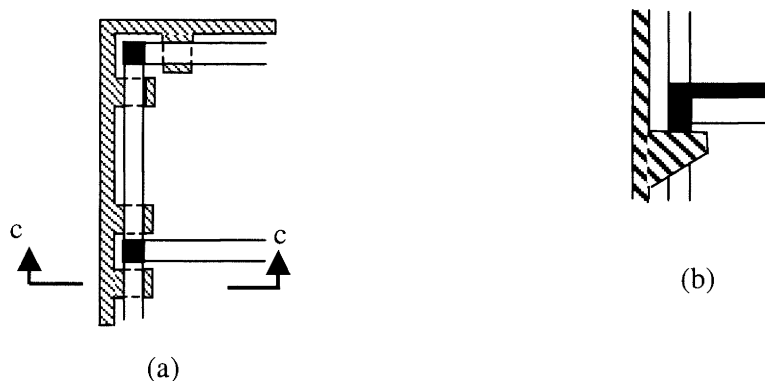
Construction of cantilever beams to transfer axial forces to new walls
